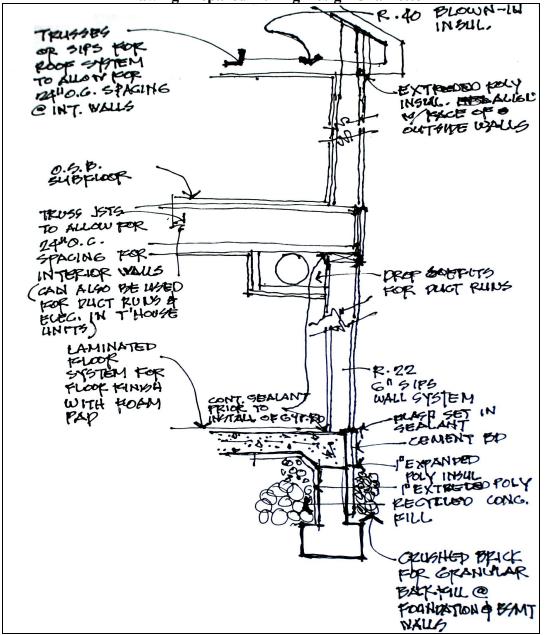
Suggested Roof and Wall Section for Six-Unit Apartment Building – Drawing Prepared During Design Charrette
